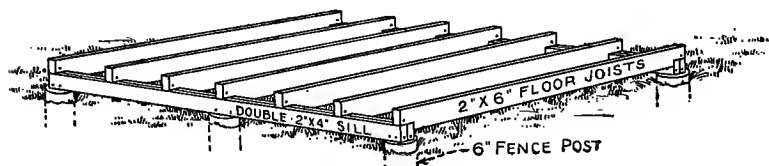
A Floor Constructed upon Sills that are Supported upon Posts.
